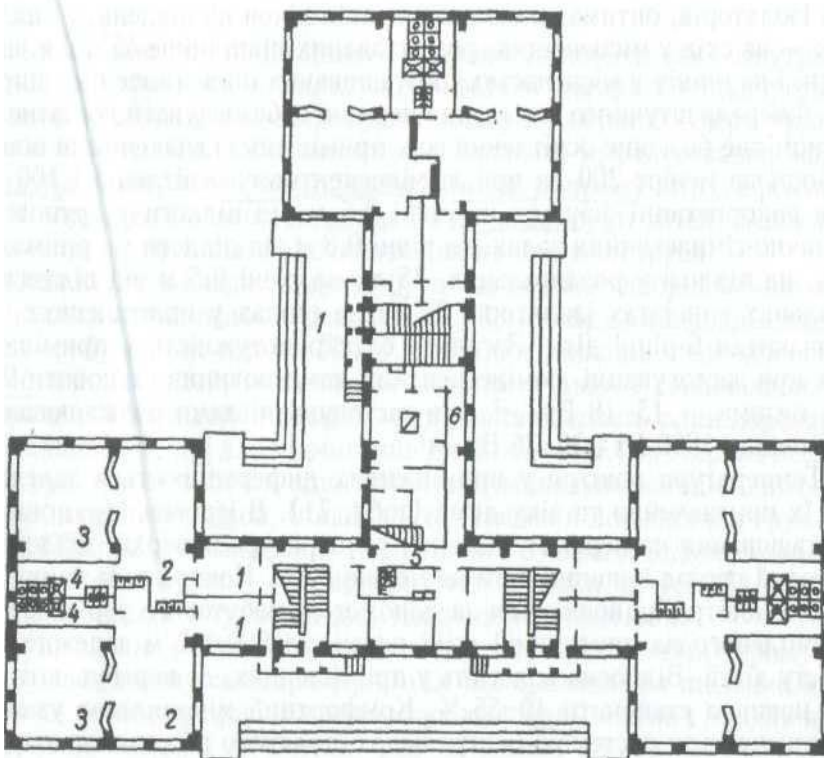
The plan of the first floor of the house of a daycare centre: 1 – a locker room; 2 – a group room from still-room; 3 – a bedroom-veranda; 4 – water closet with shower cubicle; 5 – infirmary; 6 – nutrition unit.
